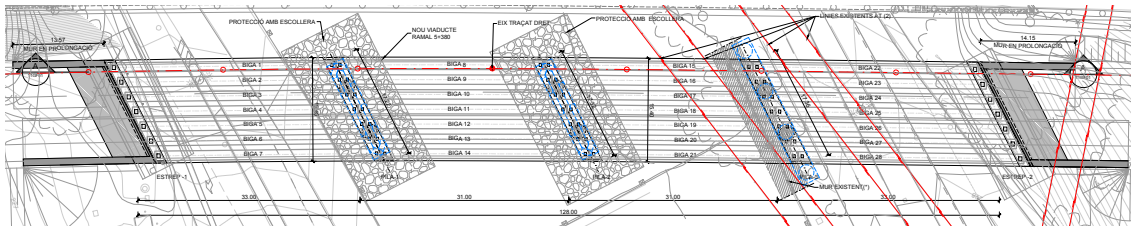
“Las Arenas Viaduct” plan view (dimensions in meters).
